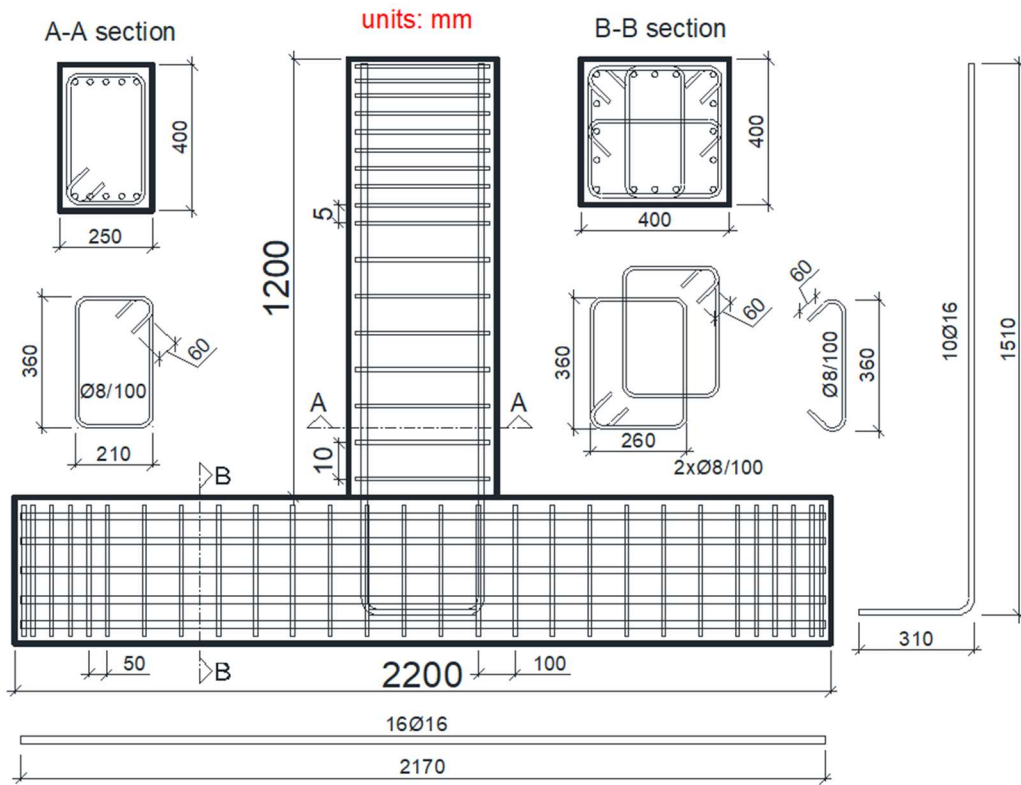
Geometric and reinforcement details of the test specimen CB2-Mon-1
